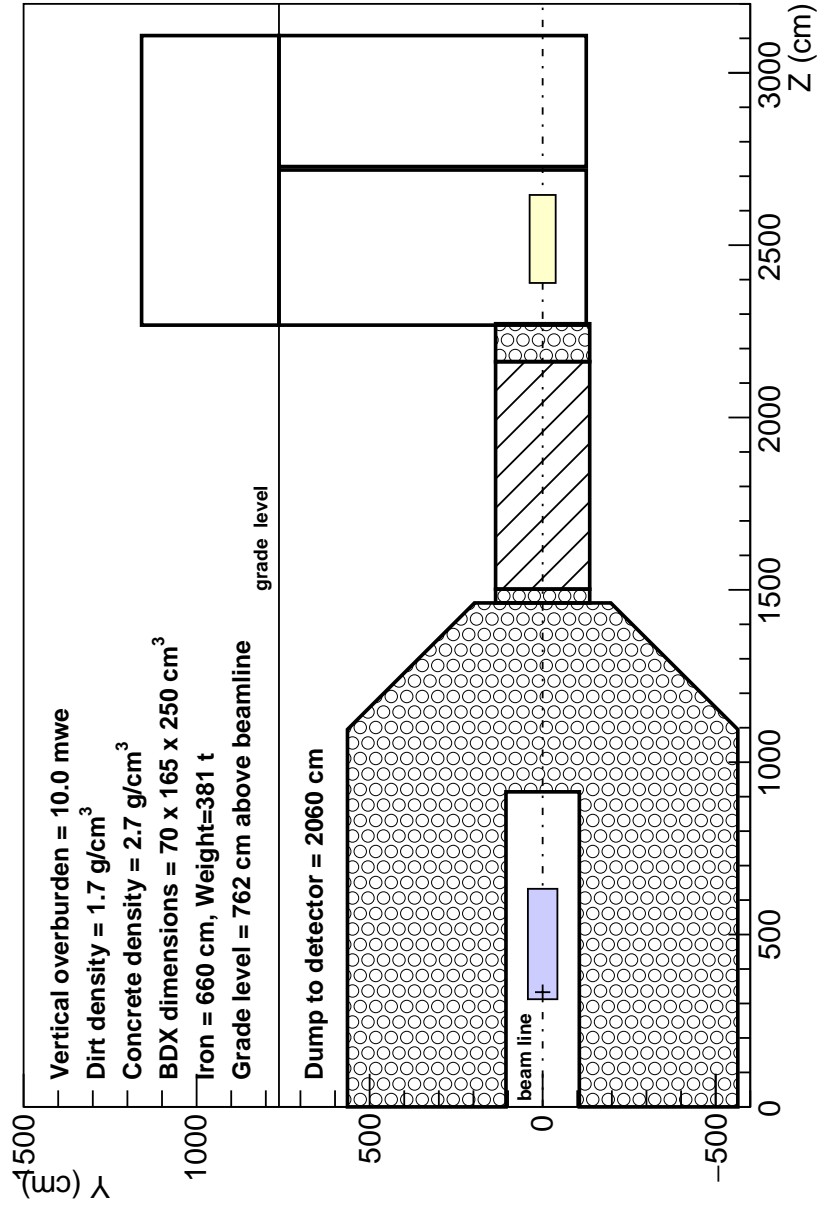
Elevation sketch of civil concept C1. This view includes the Hall A beam dump proper and surrounding concrete, filling material between the beam dump and the BDX experiment, the detector in the underground room and staircase area. General parameters and assumptions are specified on the drawing.
